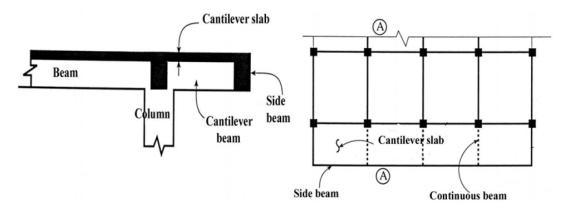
Cantilever Slabs (Özmen, 2008)
